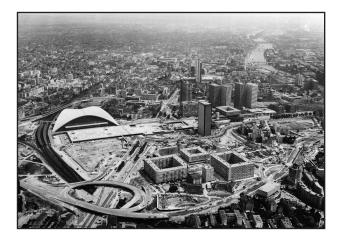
1971 aerial photograph shows the agony of construction endured by the pioneering residents and office workers. Note the even height and floor plates of the towers. The *dalle* is taking shape in front of the CNIT building, the freeways and suburban railroad are already complete. (EPAD photo courtesy De Facto)
